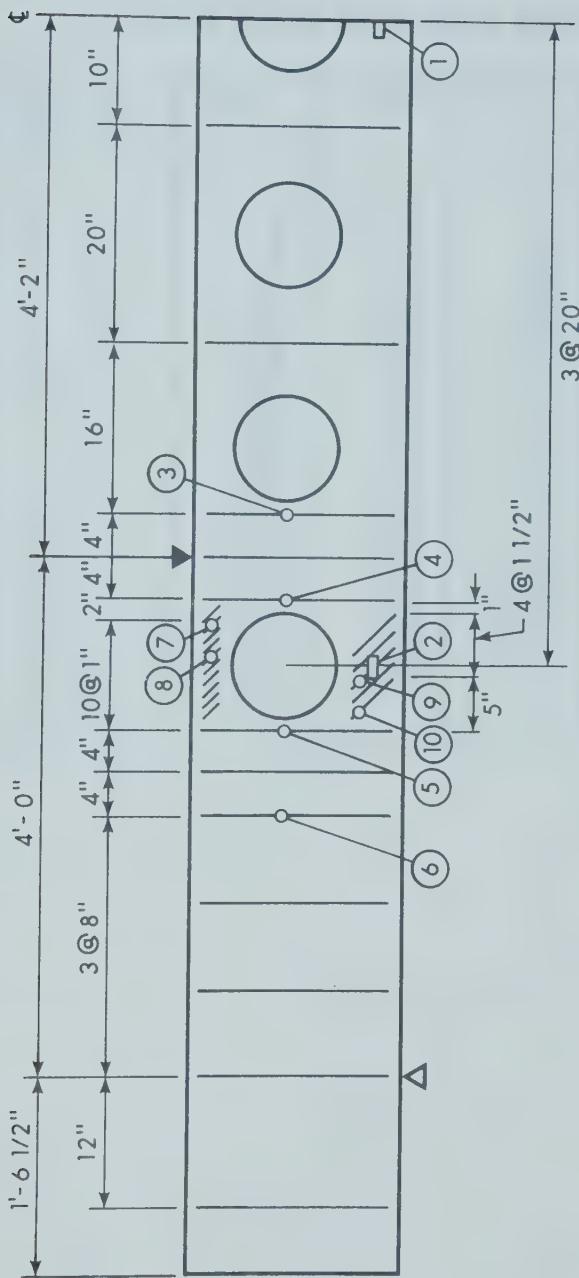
BEAM AD-10 REINFORCEMENT AND GAUGE DETAILS
